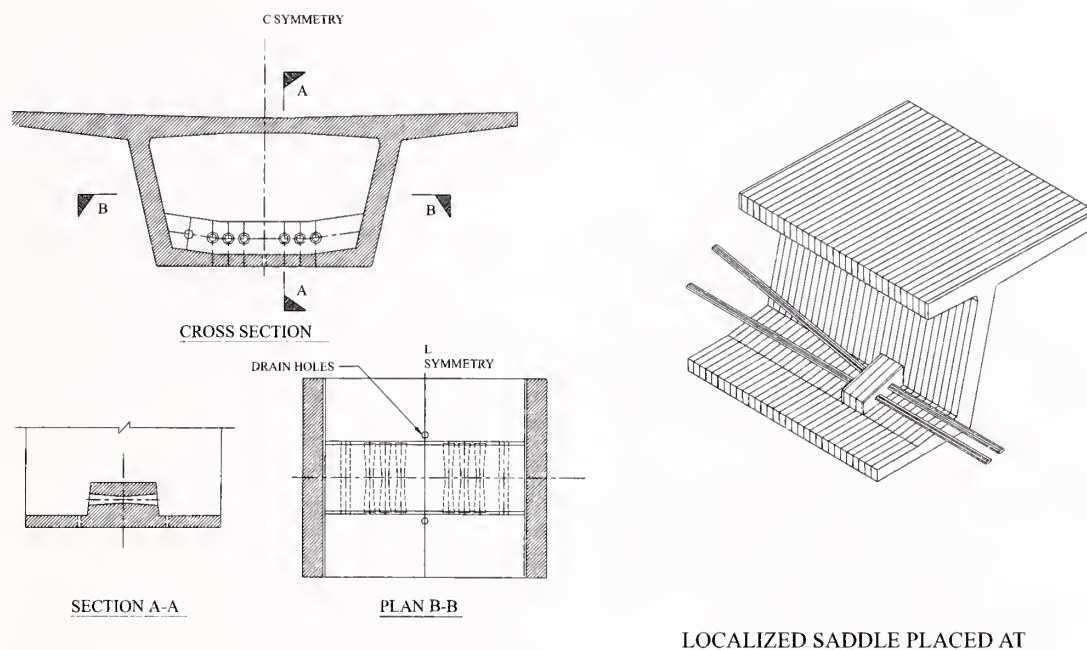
Arrangement of Deviator Blocks for New Constructions
